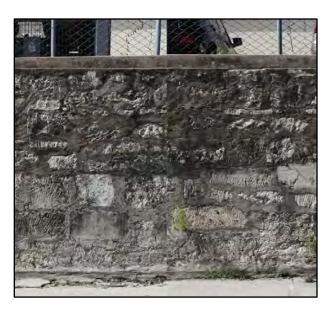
Two distinct construction styles along the west retaining wall, note difference between bottom and top half of the wall.
